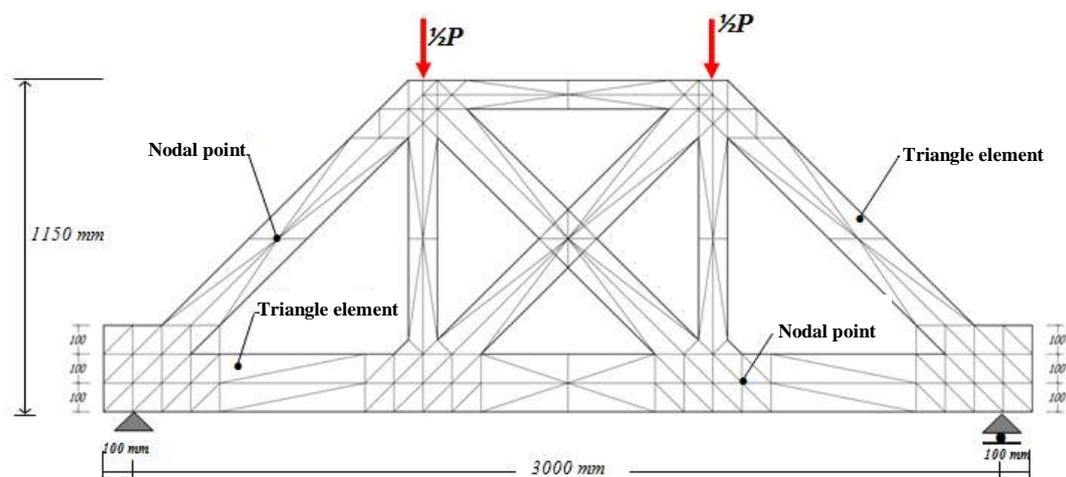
Discretization of Bamboo Reinforced Concrete Bridge Frames
